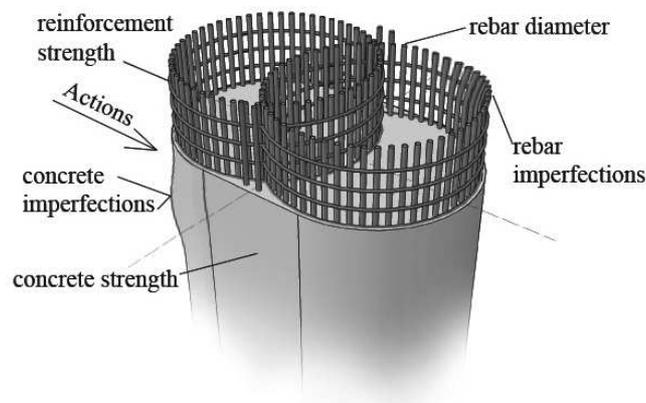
Some of the possible imperfections and uncertainties in the reinforced concrete pier
